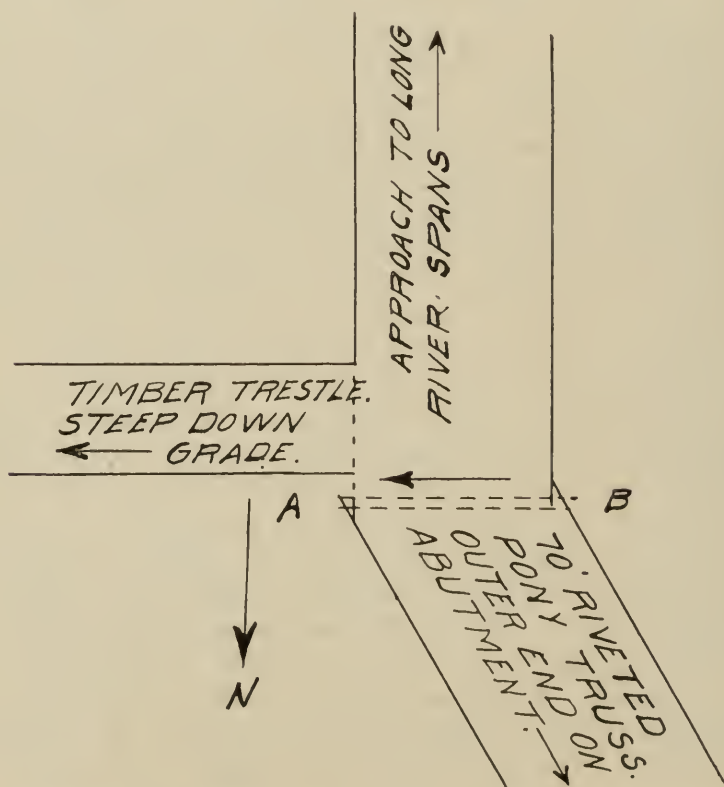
Plan of Bridge. "A B" Bent with Distorted Columns.
